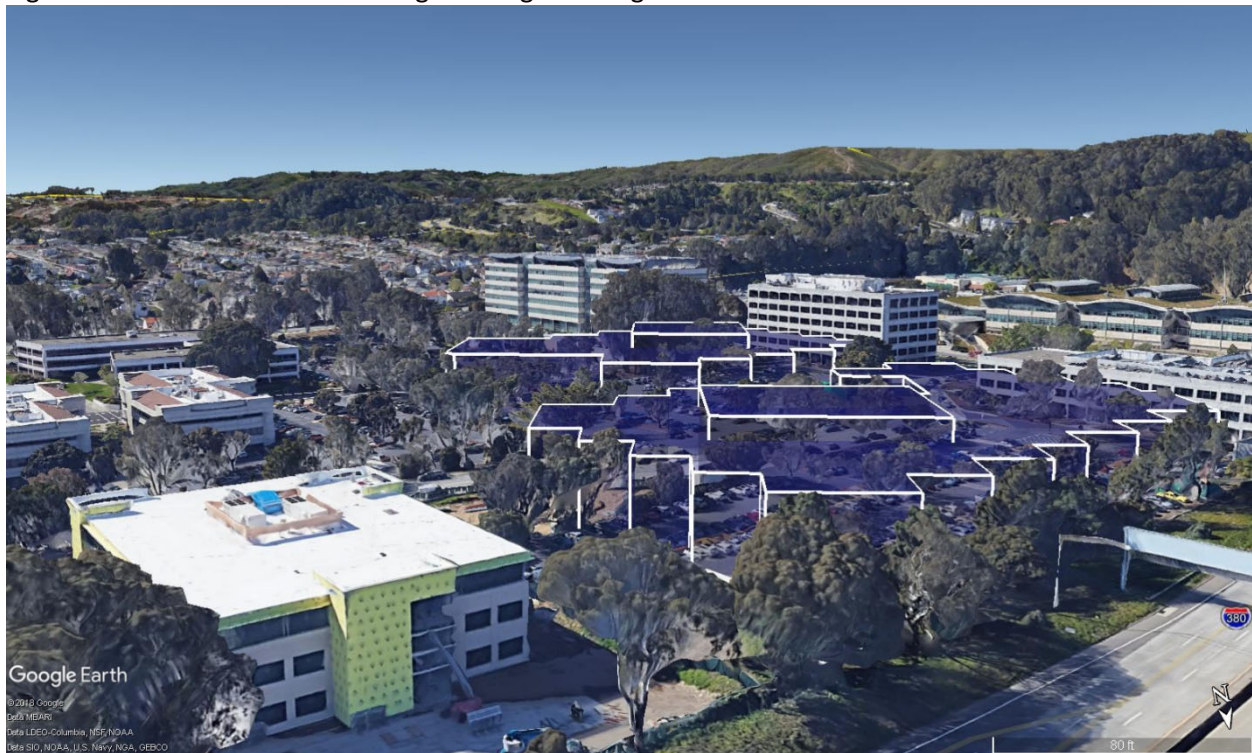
YouTube Phase 1 Building Massings Looking Northwest
